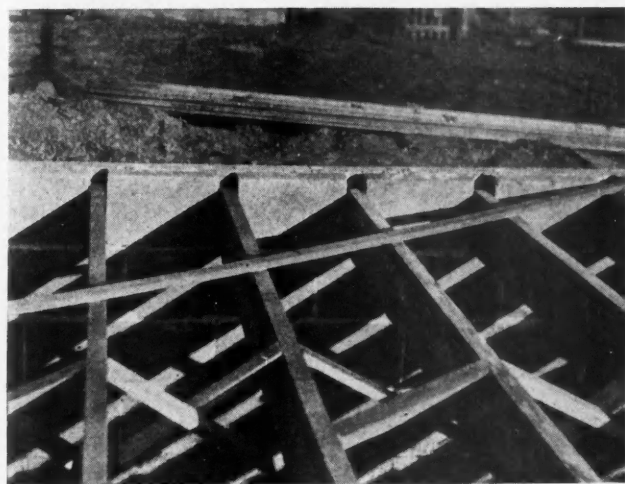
Illustrating Well-Handled Detail in Construction of the Concrete Block Houses at Omaha. The Wooden Floor Joists Are Held Securely in Place and the Space Between Joists Neatly and Tightly Filled by the Use of Special Joist Block Which Are Substituted for the Regular Inside Wall Block at the Course Shown.
